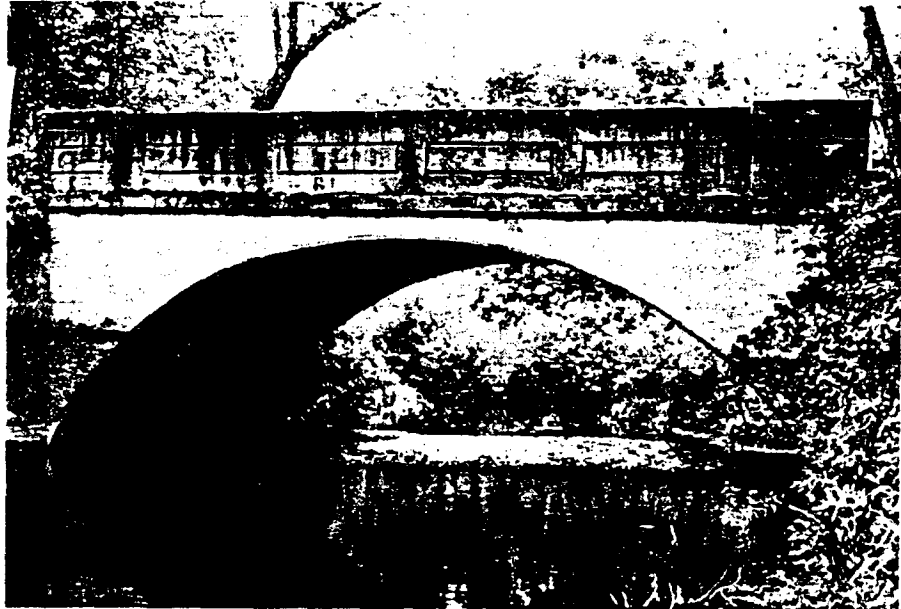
Typical single-span Luten barrel arch highway bridge. This type, patented by Daniel B. Luten, was built throughout Virginia.
